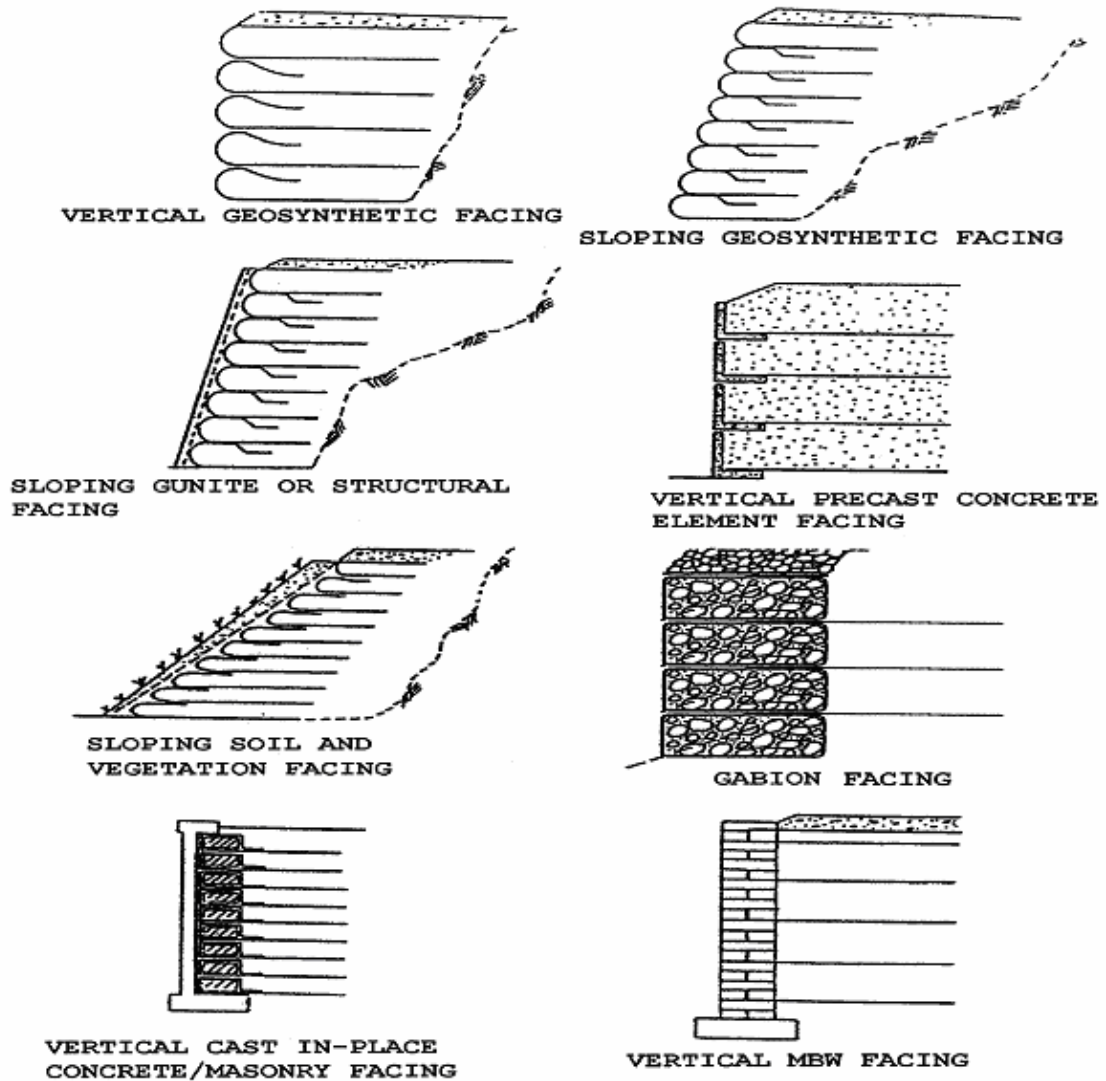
Types of geosynthetic reinforced soil wall facing [1]
